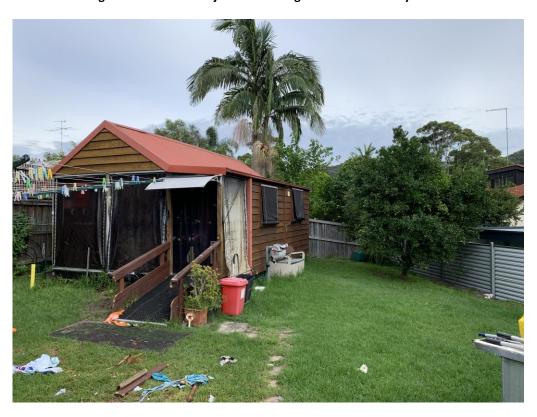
View of the existing rear yard and the location of the additions to the current outbuilding to provide for a new secondary dwelling, looking west
